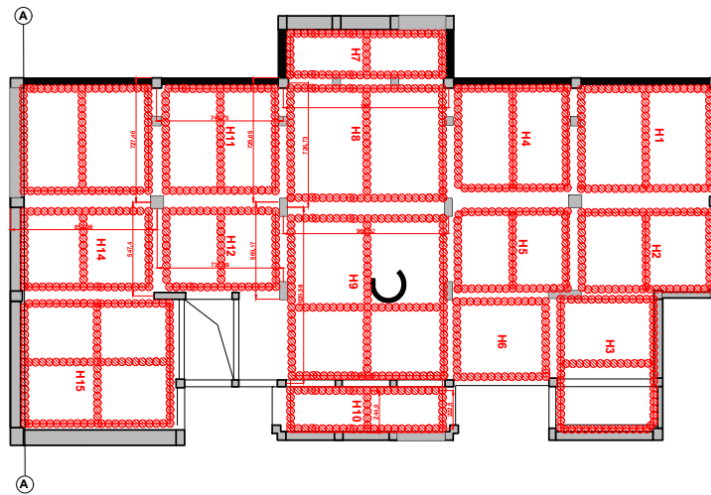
Application plan drawings of jet grout cells the plan of H block
